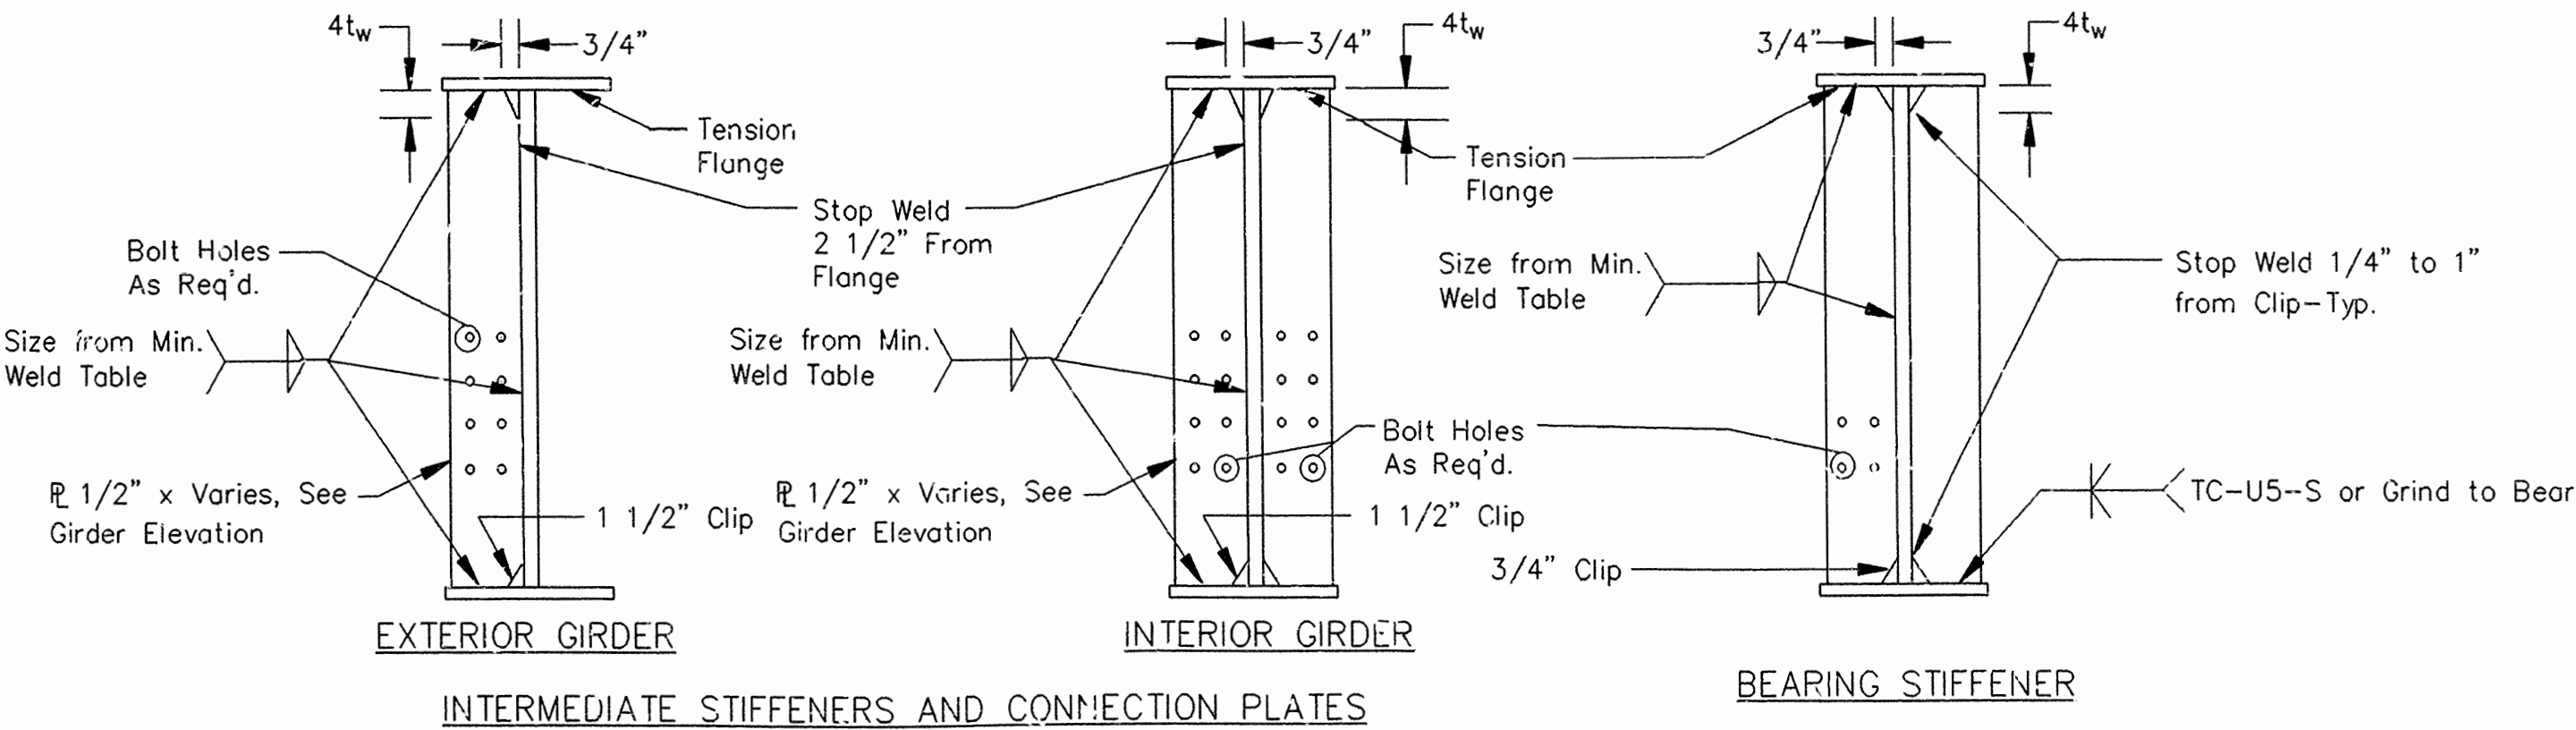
PLATE GIRDER CONNECTION AND STIFFENER PLATE DETAILS
